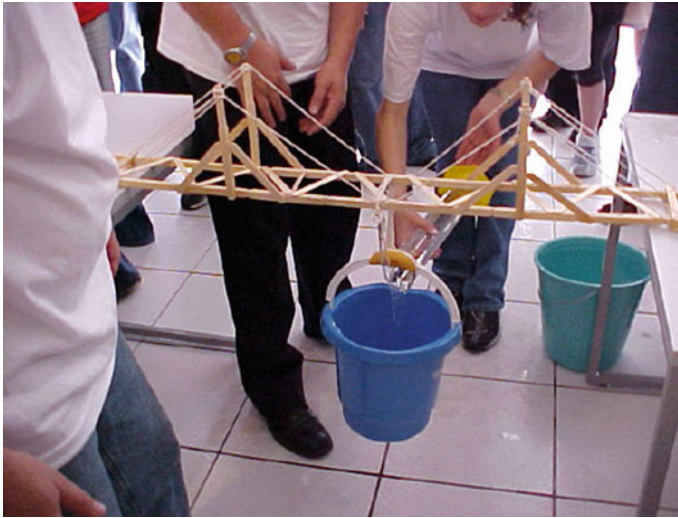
Load testing on bridge built with popsicle sticks [17]
